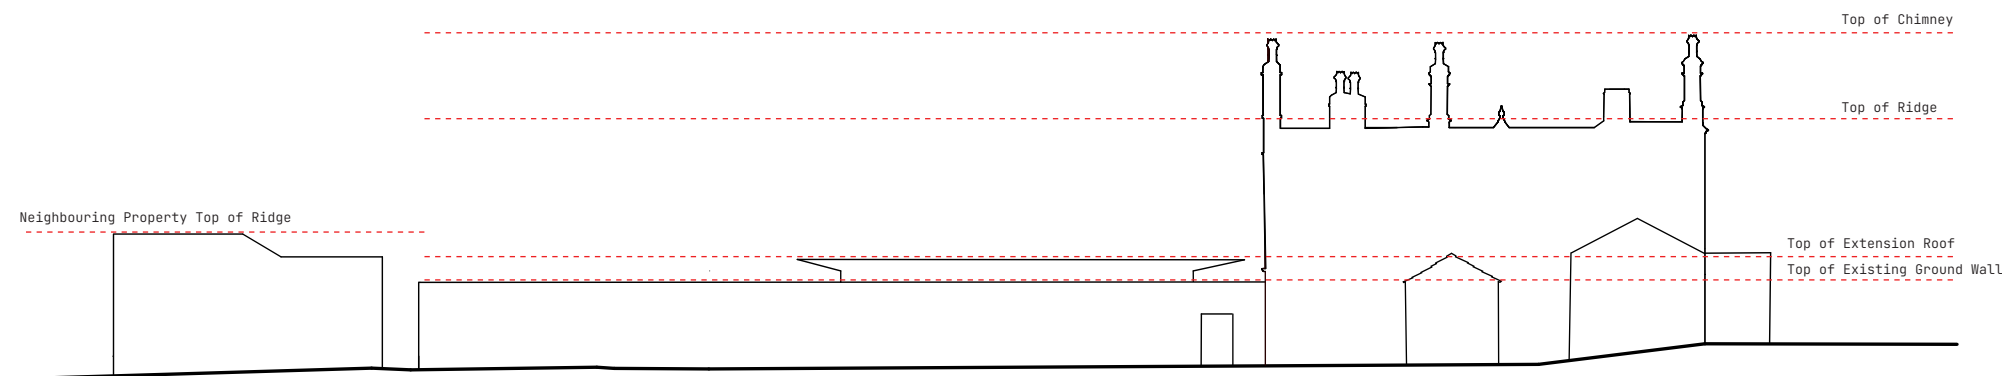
Side Elevation Showing Proposed Outline clearly highlights the minimal visual impact on this particular elevation
